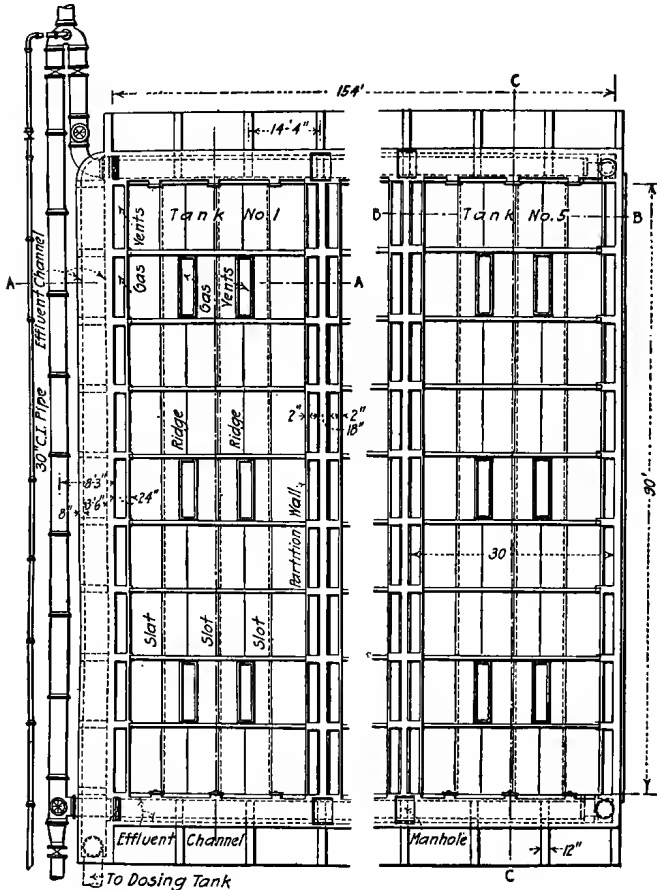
Partial plan of Imhoff tanks, Fitchburg, Mass.
